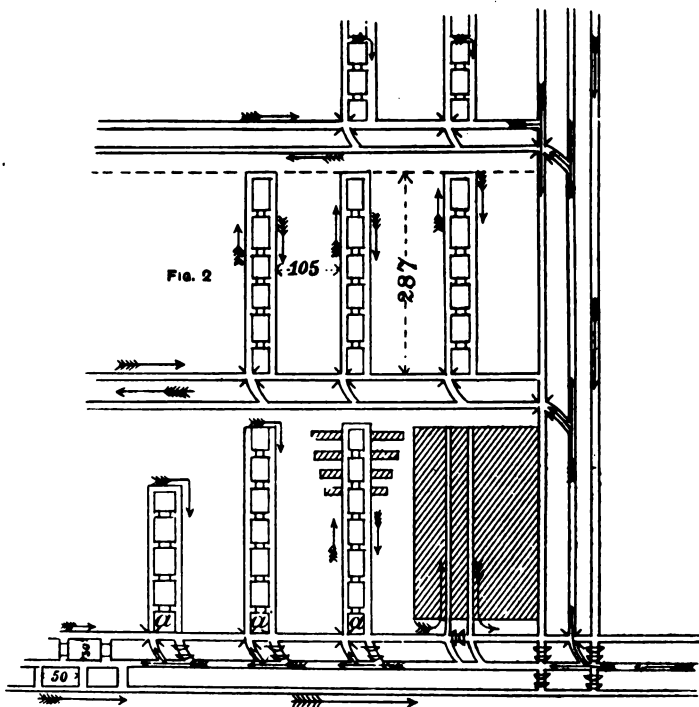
Portion of a Plan showing Double Stall Workings.
